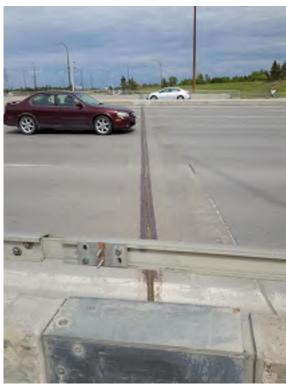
South expansion joint, southbound lanes, very narrow gap. 2017-08-23
